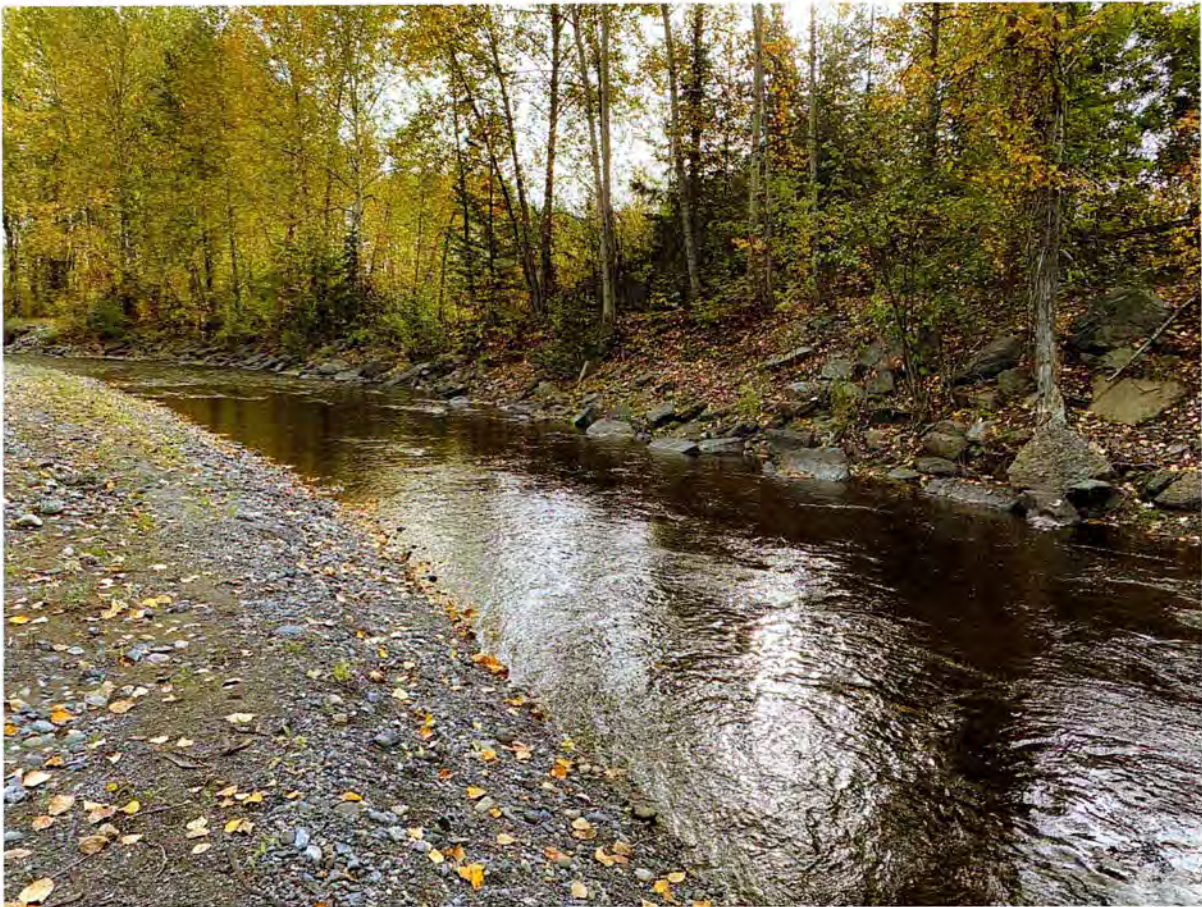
Concrete slabs along the right bank of Baker Creek, looking downstream. Photo taken on September 28, 2024.
